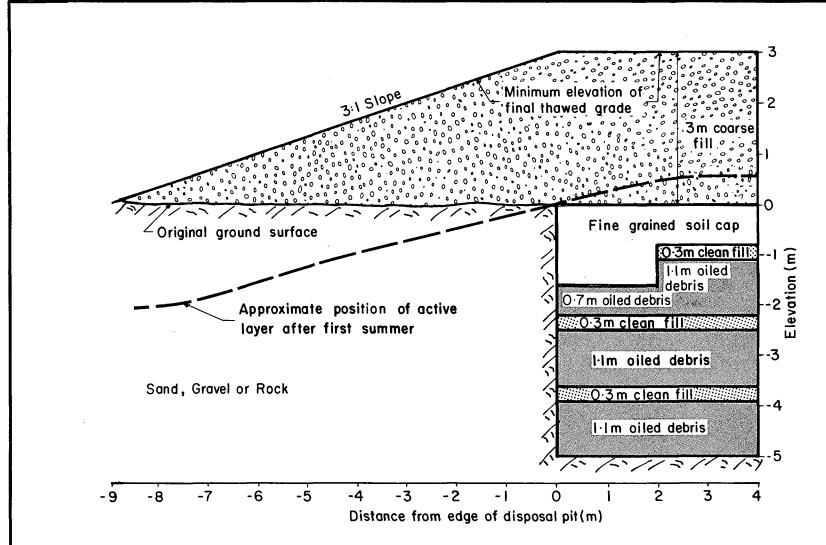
FIGURE I TYPICAL LANDFILL SECTION IN SAND, GRAVEL OR ROCK DEPOSIT SUMMER CONSTRUCTION
